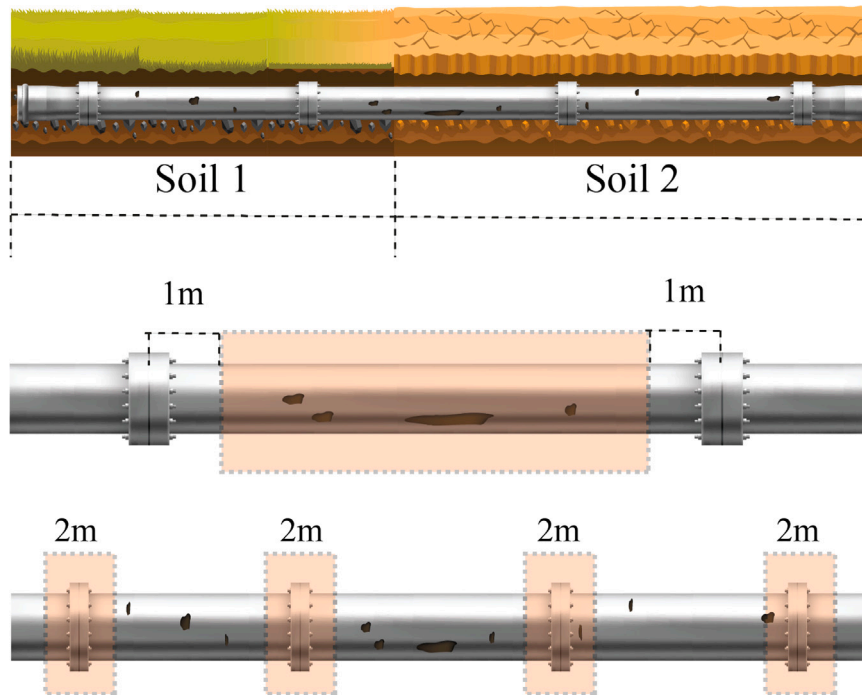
Scheme of the three main analysis, using flanges to represent the welding joints.
